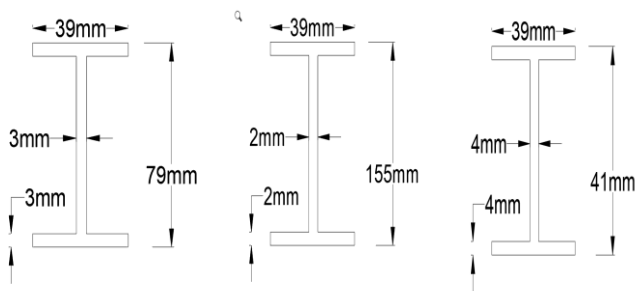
Dimensional Parameters of Novel Crooked bracings used in this study
